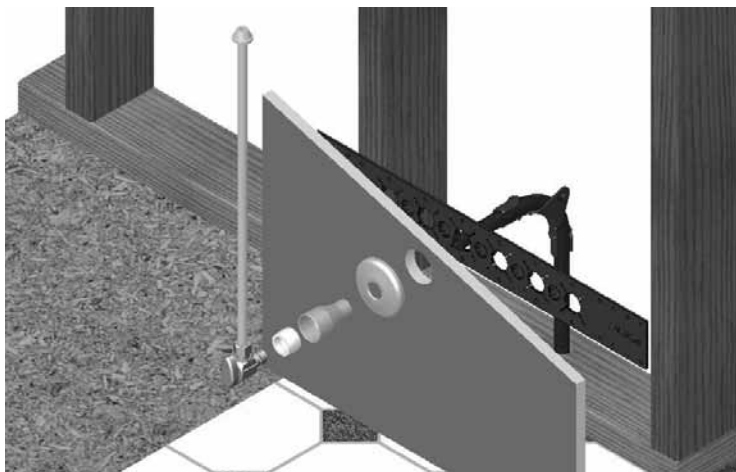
Installation Example of ProPEX Out-of-the-Wall Support System
